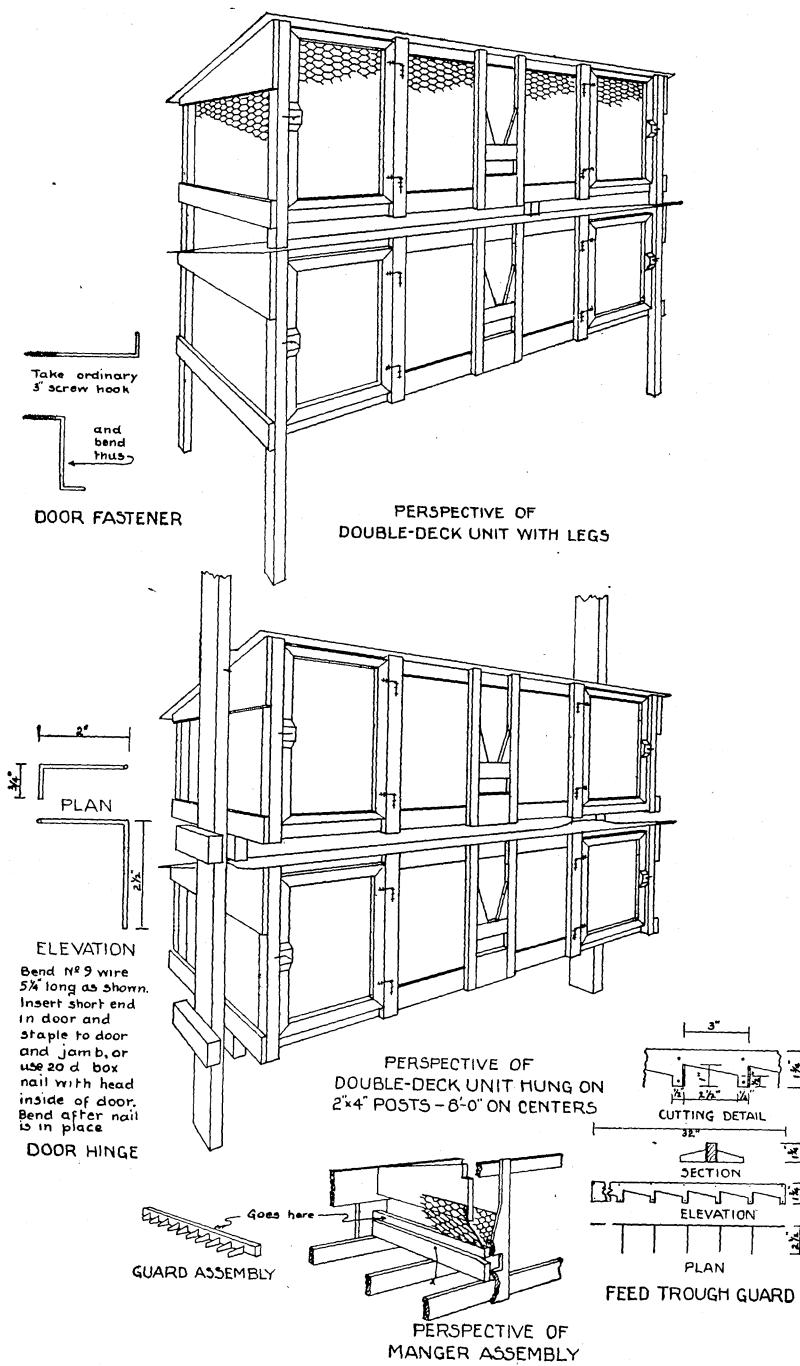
Additional construction details for a two-unit wooden-frame wire hutch, including manner of hanging two tiers of hutches.
